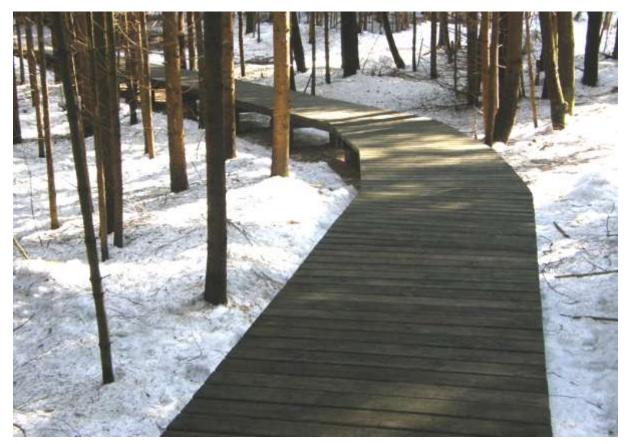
Fragment of a new footbridge on the trail "Around Wigry".
